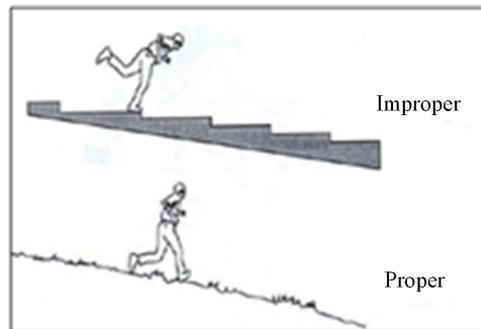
Using ramps instead of stairs (National Building Regulations: Topic 21)
